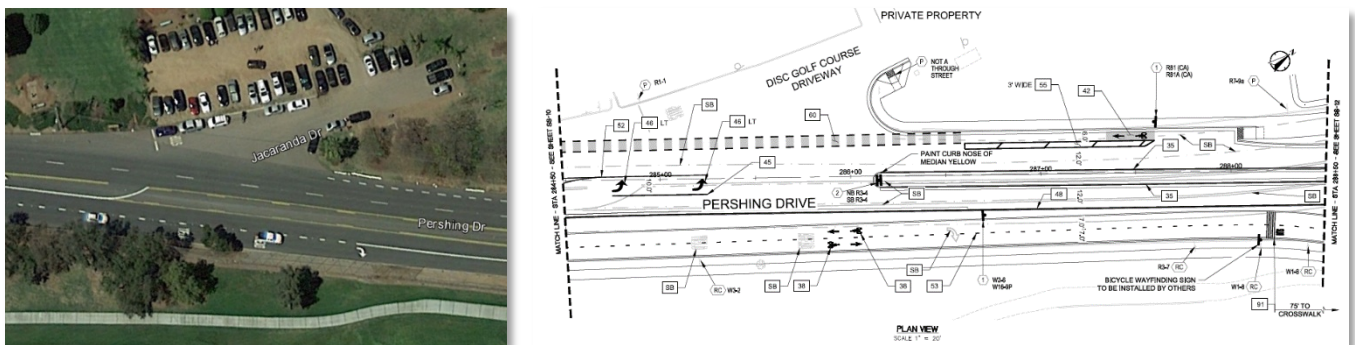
Existing and Proposed Improvement at Pershing Drive South of Redwood Street
